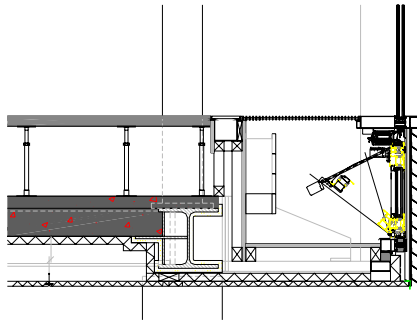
Inlet grill and window for natural day and night ventilation at the bottom of the curtain wall.
